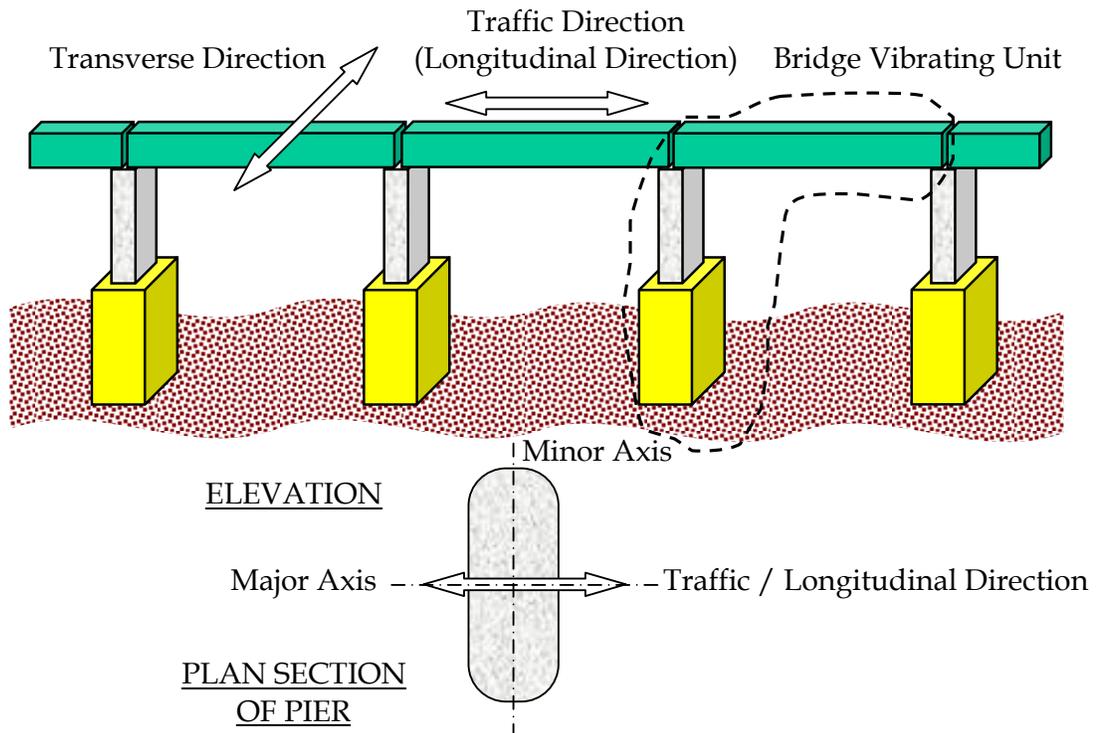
Single pier bridge vibration unit with typical orientation of the pier section.
